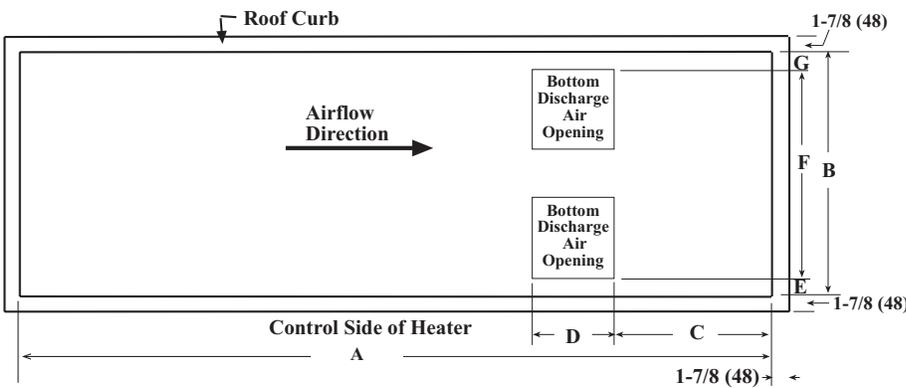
Vertical Duct Connection in Relationship to Reznor® Roof Curb
